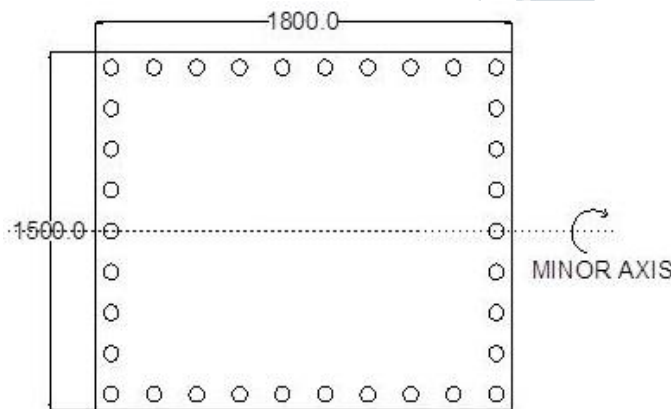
Bridge Pier Column Section (1800mm. x 1500mm)
